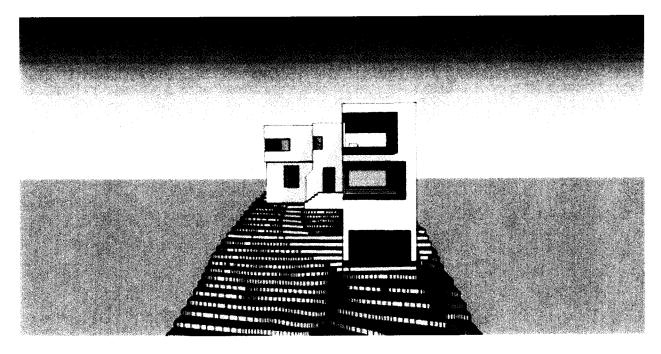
135 Belgrave New Project Artist Renderings
